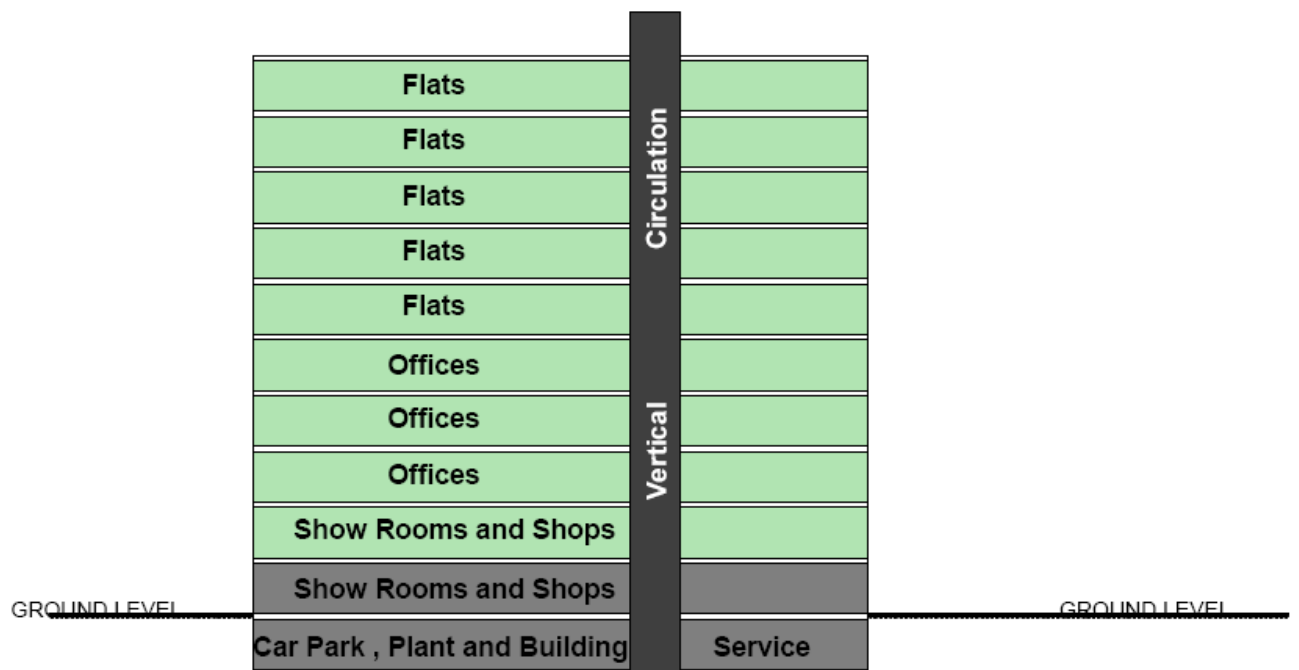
Typical Cross Section of Al-Baghdadi Buildings
